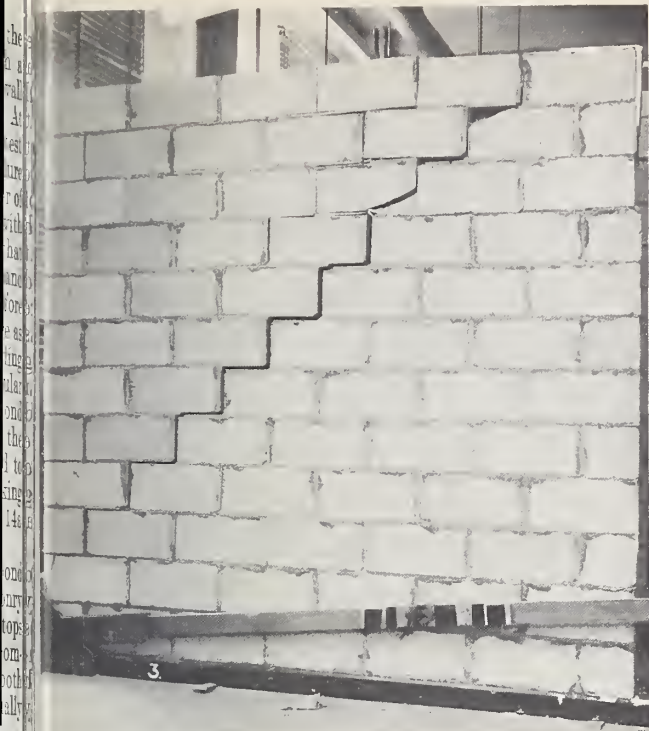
Shear failure of concrete masonry wall BS-1
